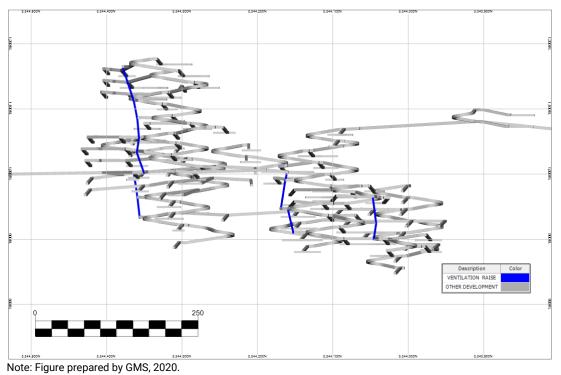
Ventilation Raise – Las Chispas (looking northeast)
